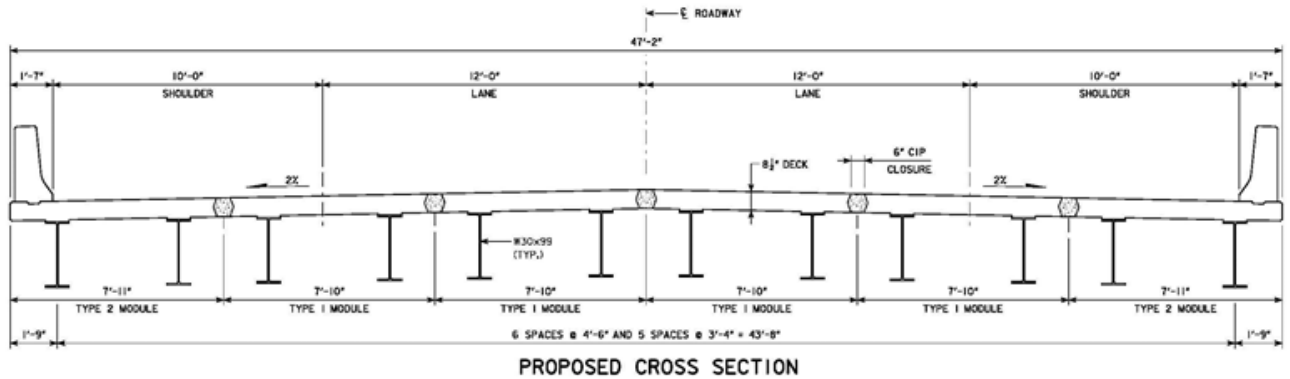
Proposed bridge cross-section. US Highway 6 over Keg Creek, Council Bluffs, Iowa.
